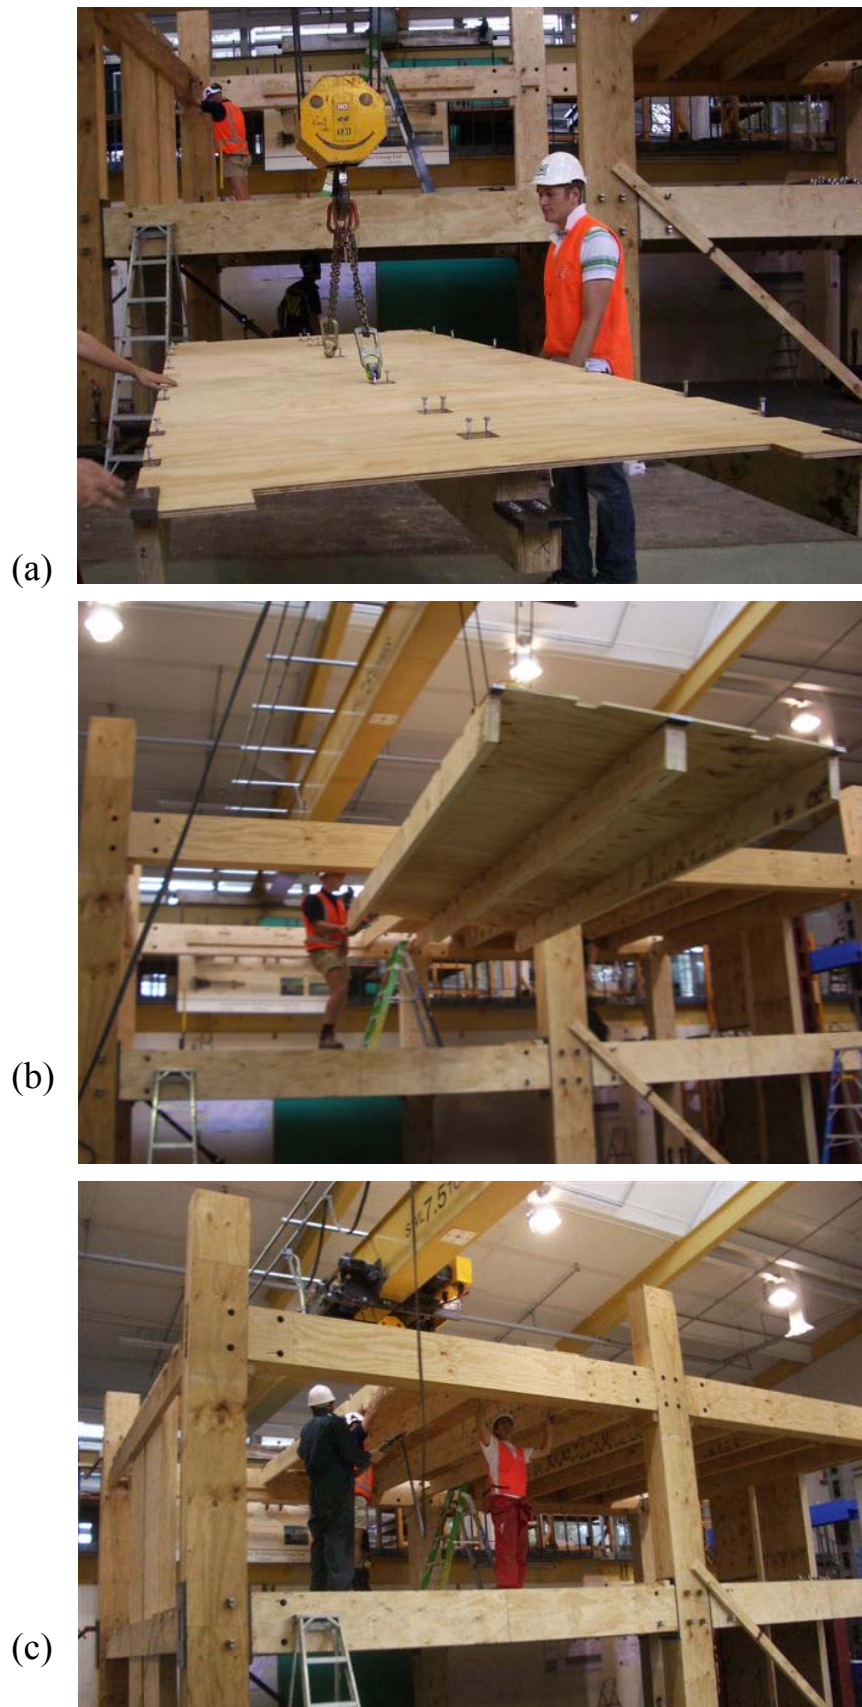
On-site assembly of floor unit: (a) Lifting of “M” section floor unit; (b) Unit craned to position; and (c) Units were manually adjusted without the help of the crane
